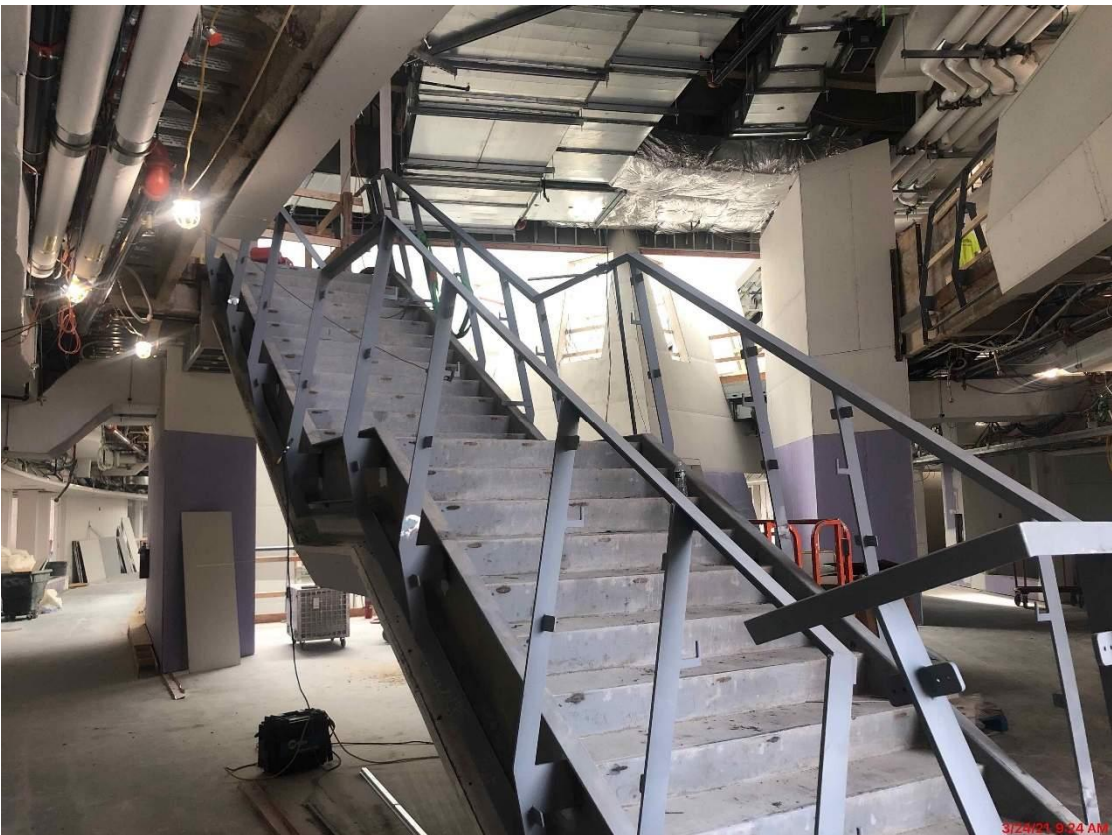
Stair 6 railings being installed in Building Area C 2nd Floor
